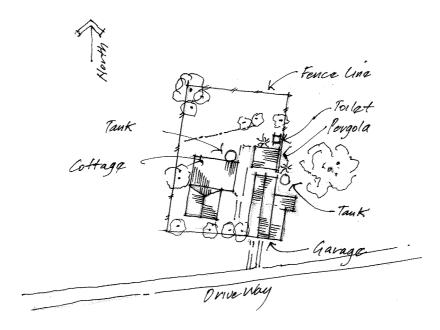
Site Plan Lot 3 Sawmill Camp
